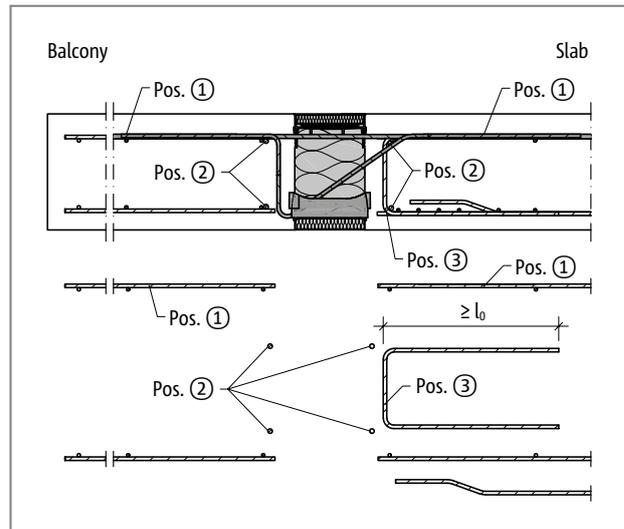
Schöck Isokorb® XT type K: On-site reinforcement with indirect support
